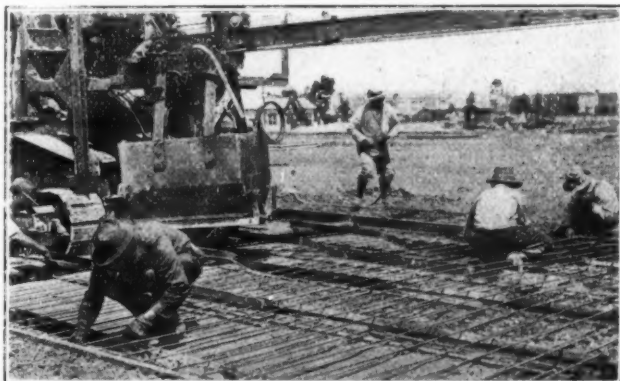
USE OF CRADLE FOR PLACING REINFORCEMENT
